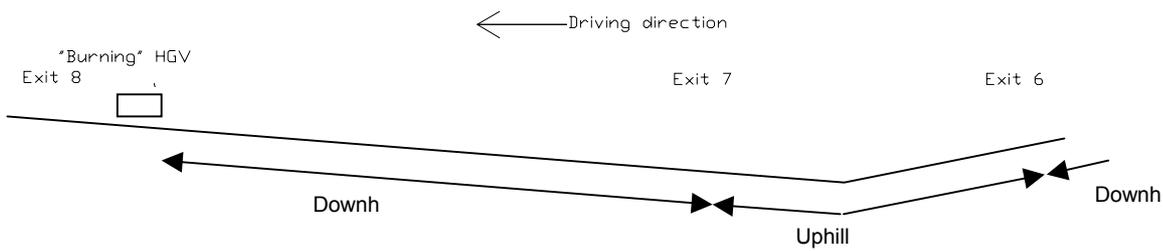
Layout of the tunnel. The tunnel’s lowest part is between Doors 6 and 7.
